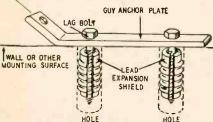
Typical guy anchor plate for anchoring guy wire to masonry or brick wall.
